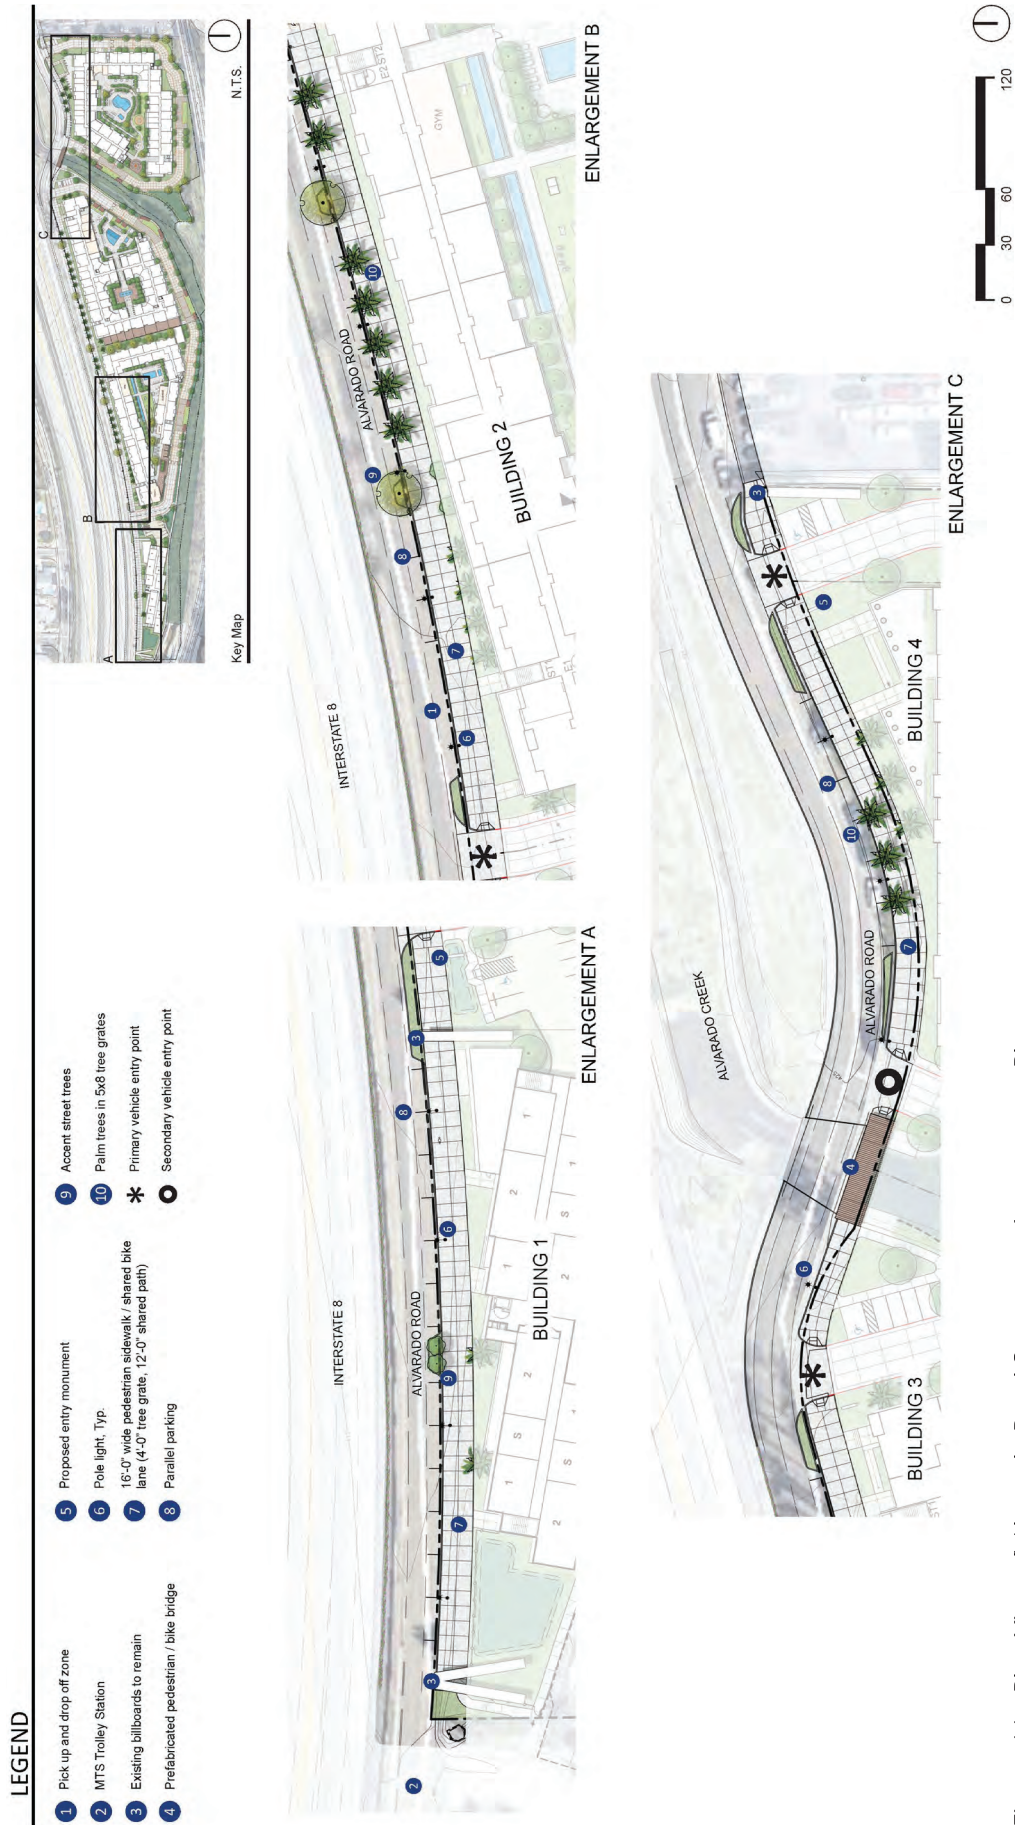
Plan View of Alvarado Road Streetscape Improvement Plans
